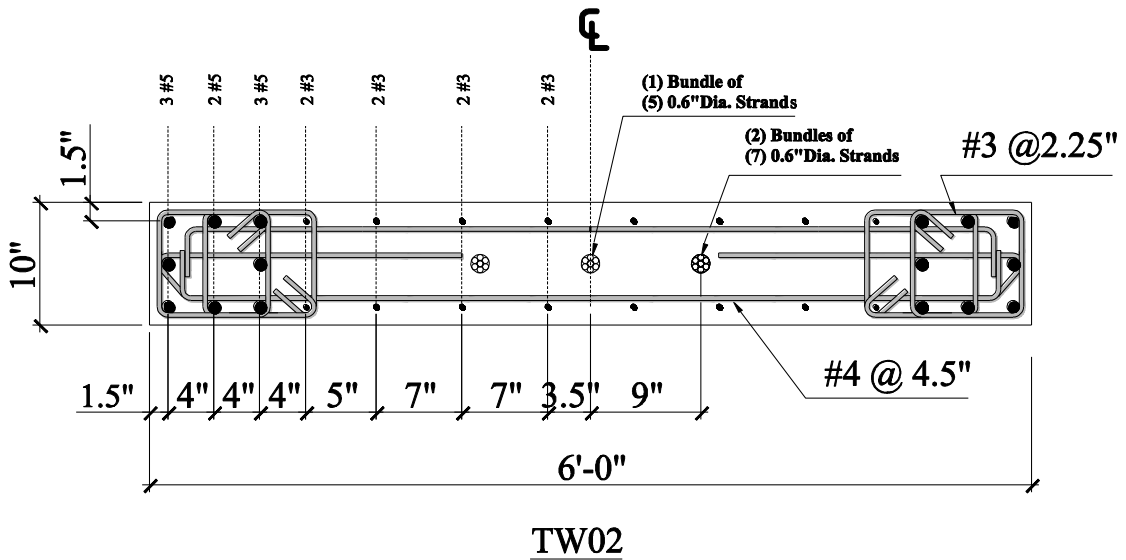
Cross-section view of unbonded PT CIP concrete special structural wall (TW02) (Rivera, 2013)
